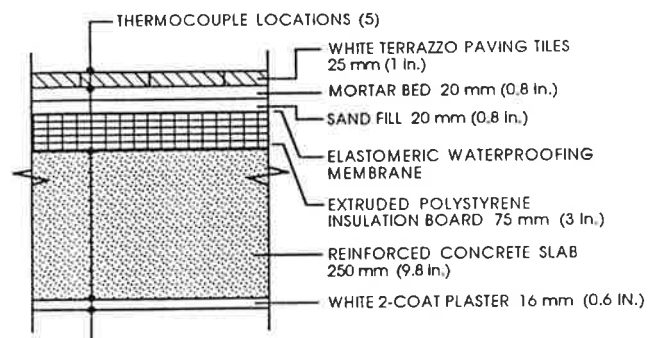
Roof 2: externally insulated (extruded polystyrene) concrete slab.
